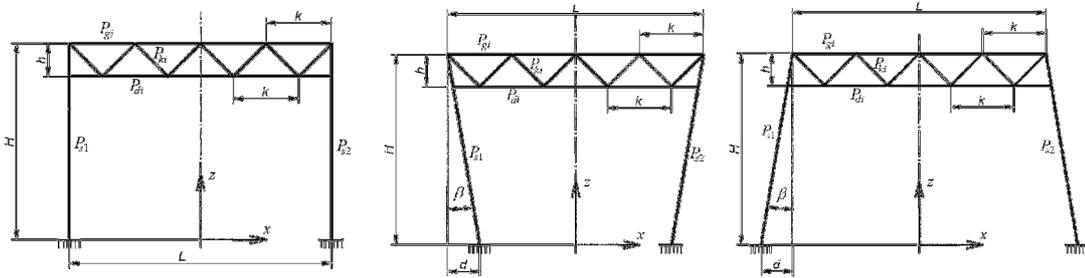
Diagrams of three different types of tested flat frames consisting of single-branched columns P_{s1} and P_{s2} , girders with parallel chords P_{d1} and P_{d2} , and V-type cross-bracing P_{ki} : (a) rectangular layout, (b) inverted trapezoidal layout, (c) trapezoidal layout
